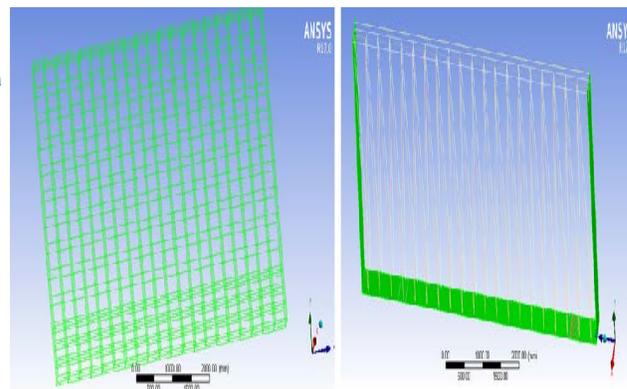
Geometrical model of conventional deep beam and hybrid steel trussed concrete deep beam
